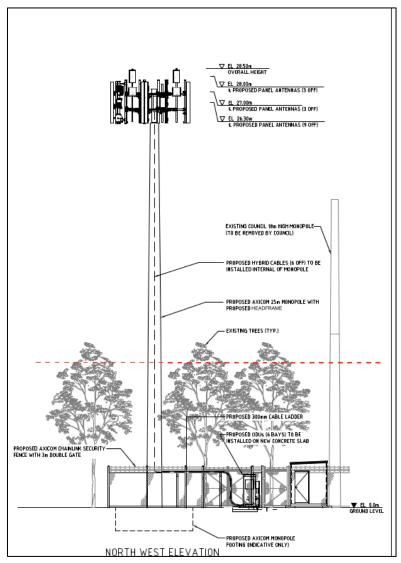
Extract of the elevations from the proposed plans. The dashed red line shows the 9.5 metre height of building limit.
